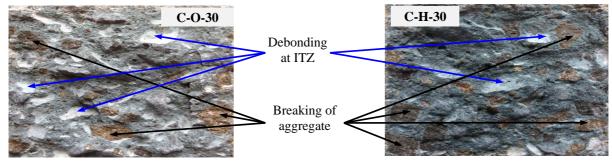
Visual observation at broken section of HAC and OPC slag concrete.
